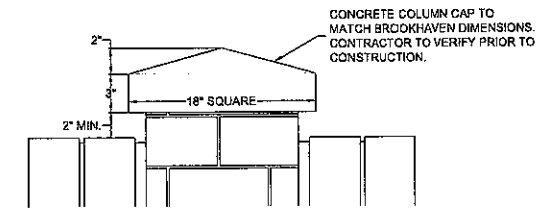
' to 8' CAST IN PLACE PRIVACY WALL
